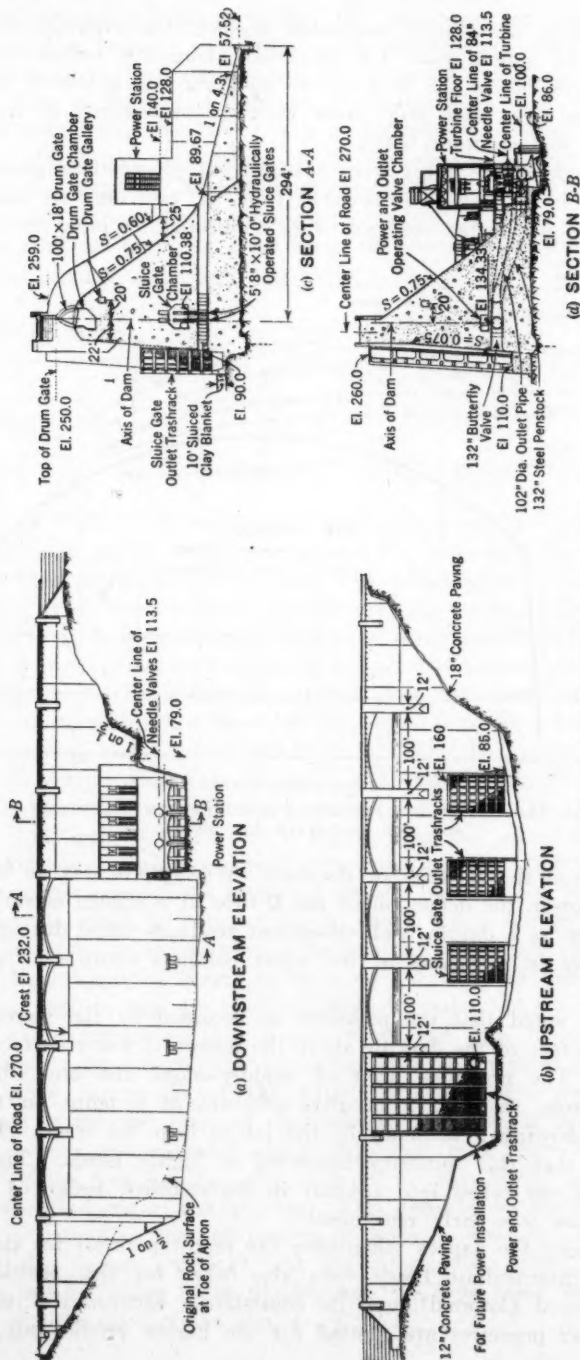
SECTIONS AND ELEVATIONS, MADDEN DAM
